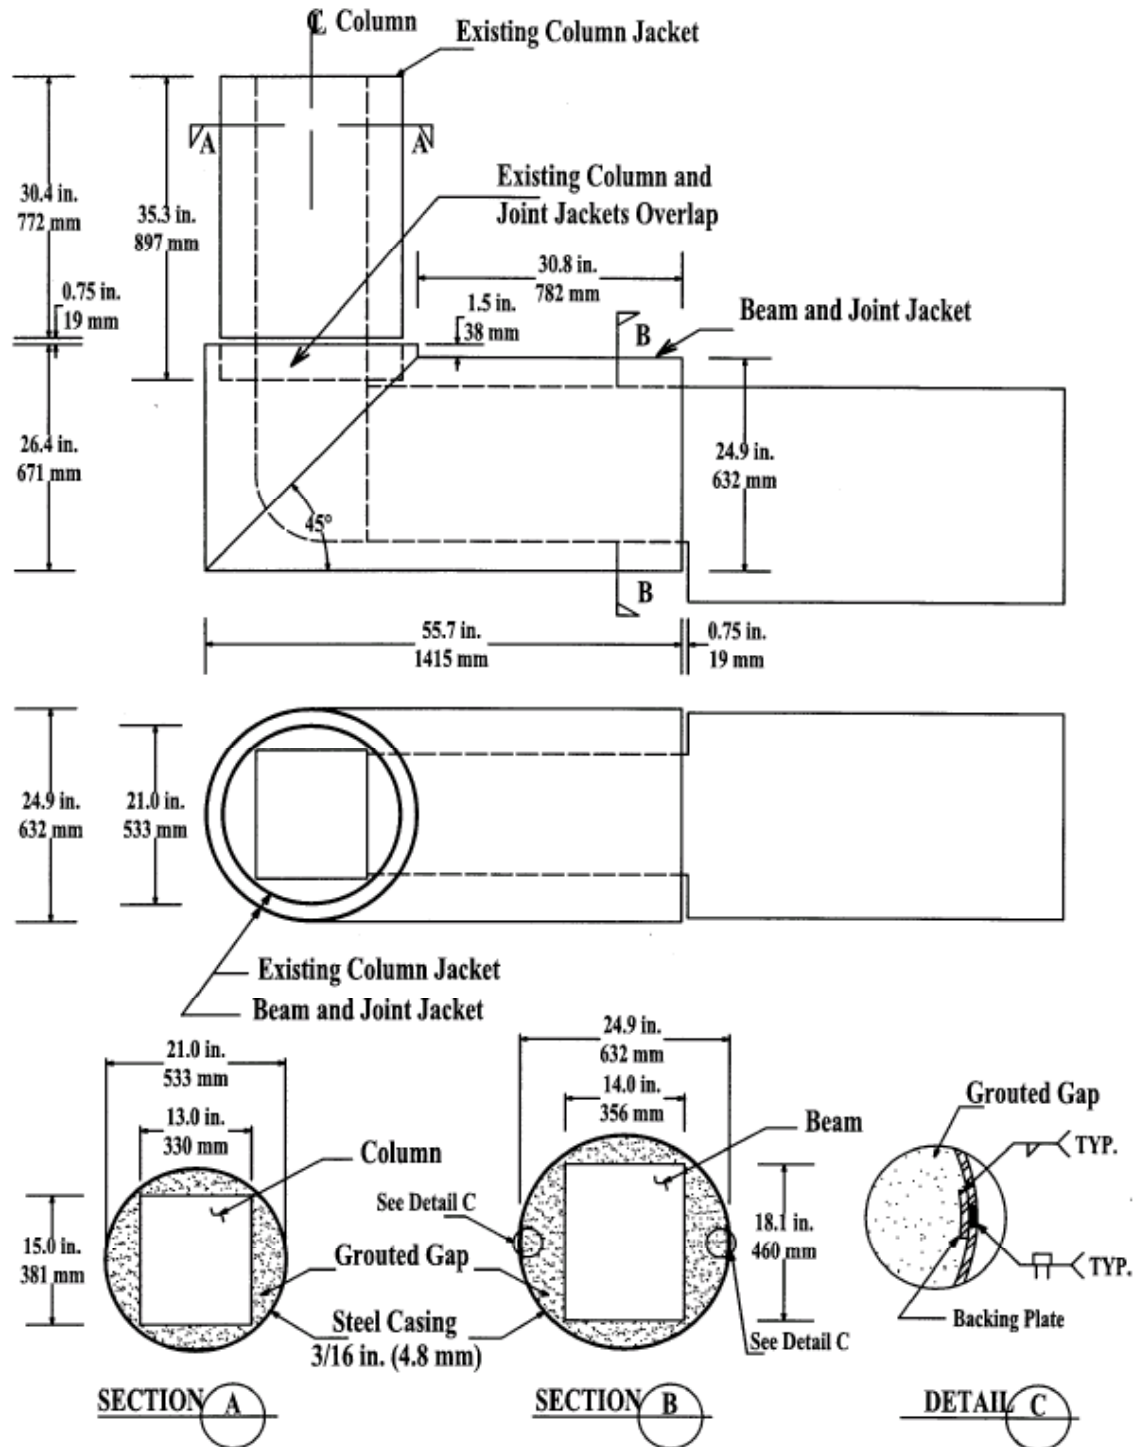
Beam and Joint Jackets Details for Specimen RLI
